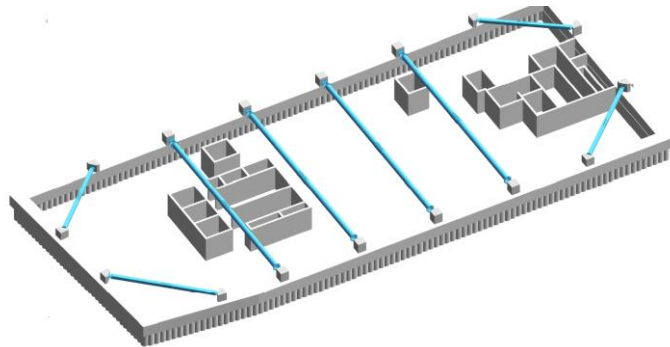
PROPPING LAYOUT - LEVEL 1
